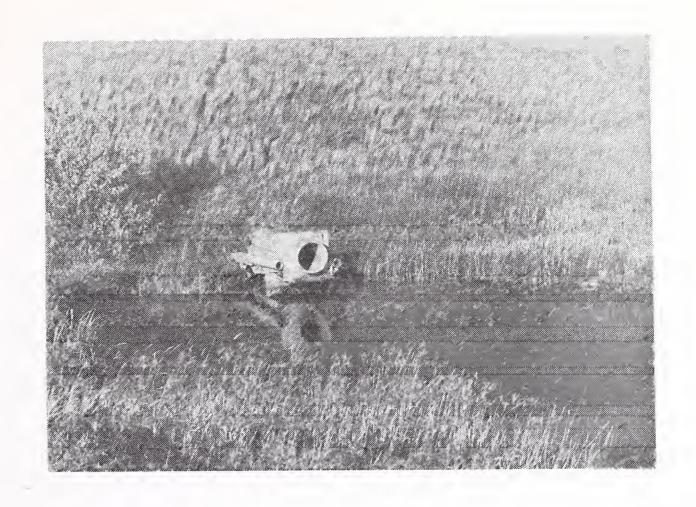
DAM EMBANKMENT UPSTREAM SLOPE
